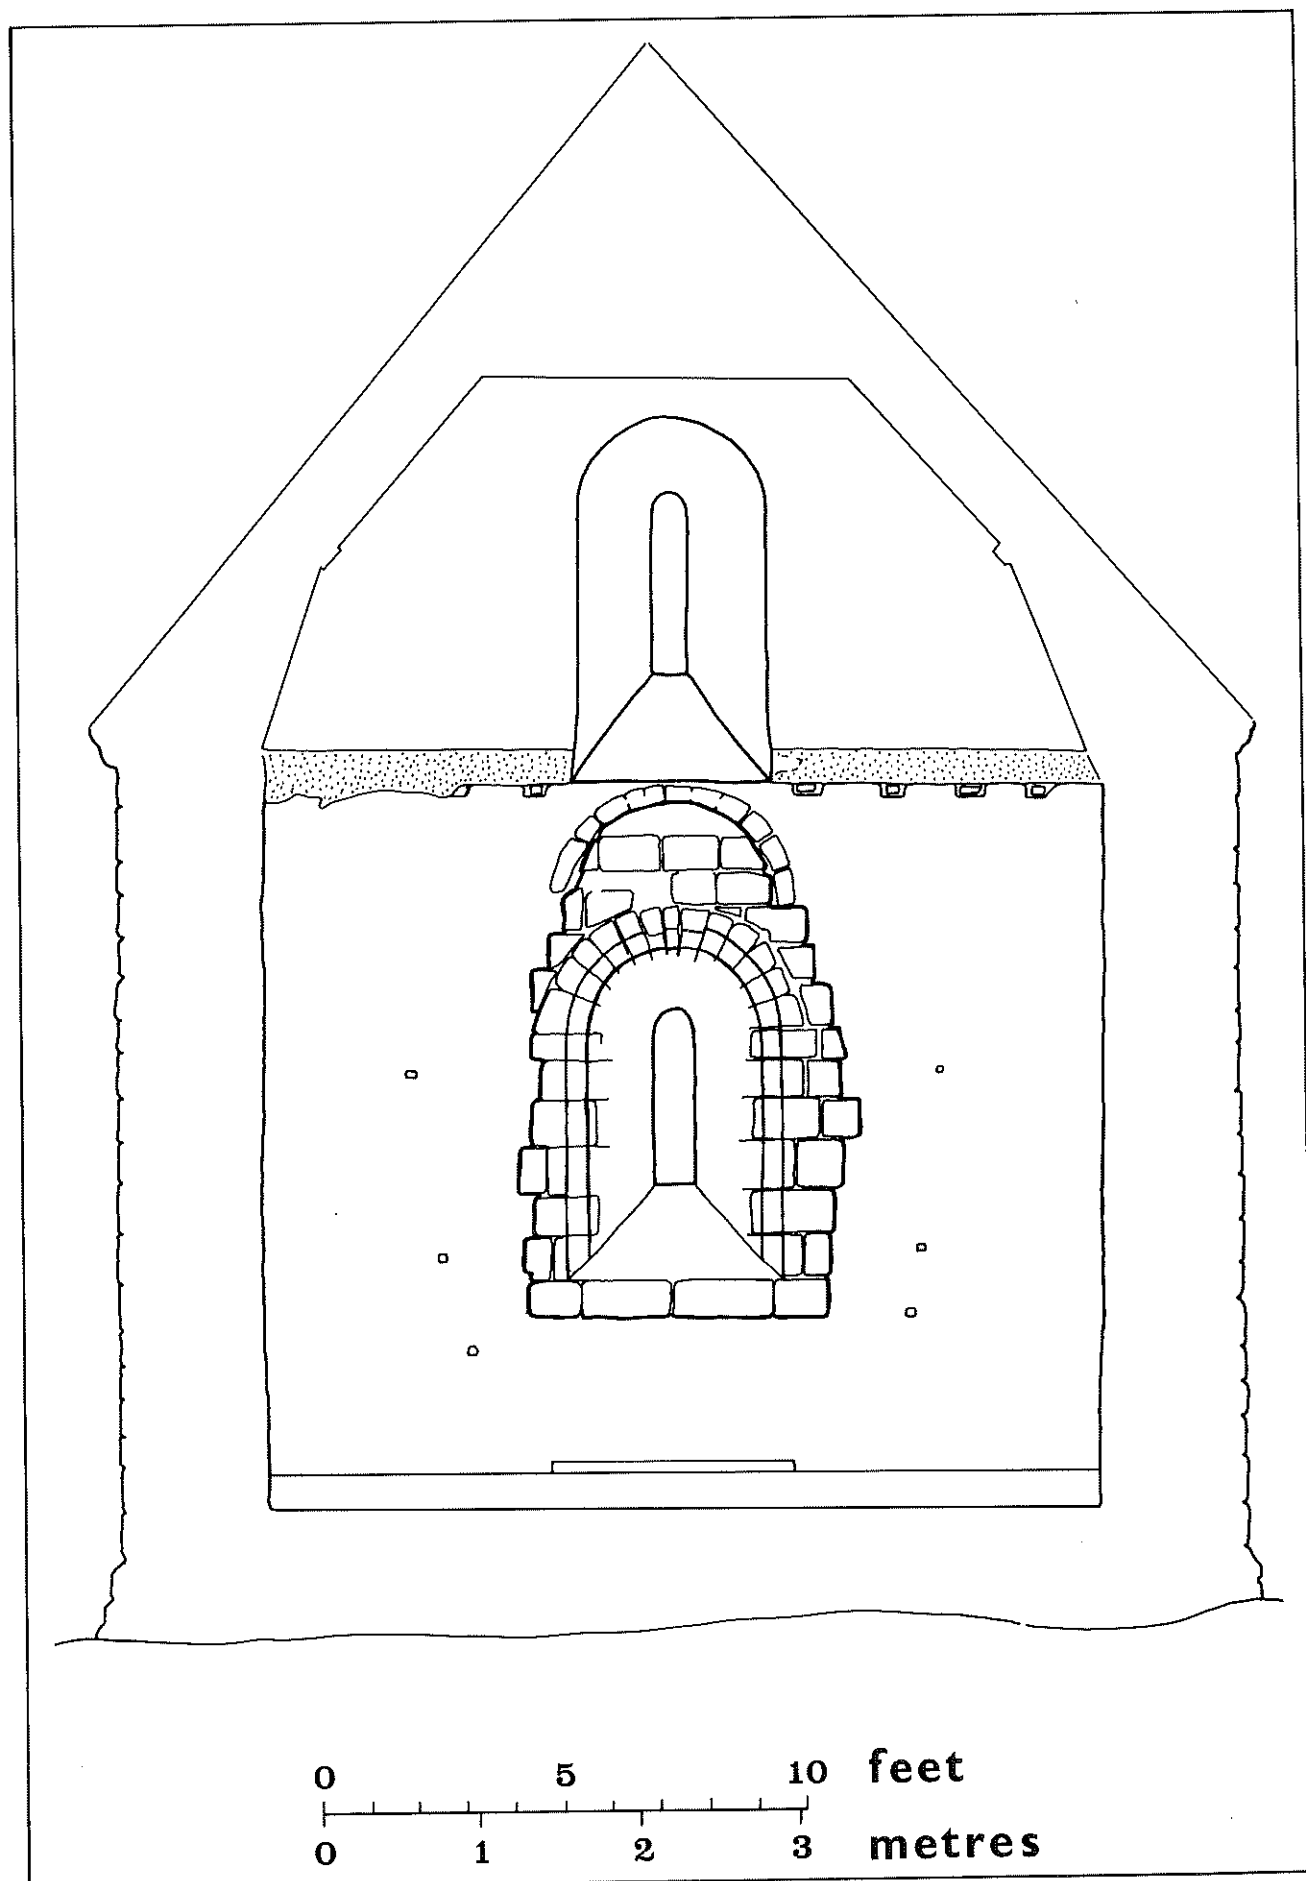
SIMPLIFIED INTERNAL ELEVATION OF THE EAST WALL OF THE CHANCEL
